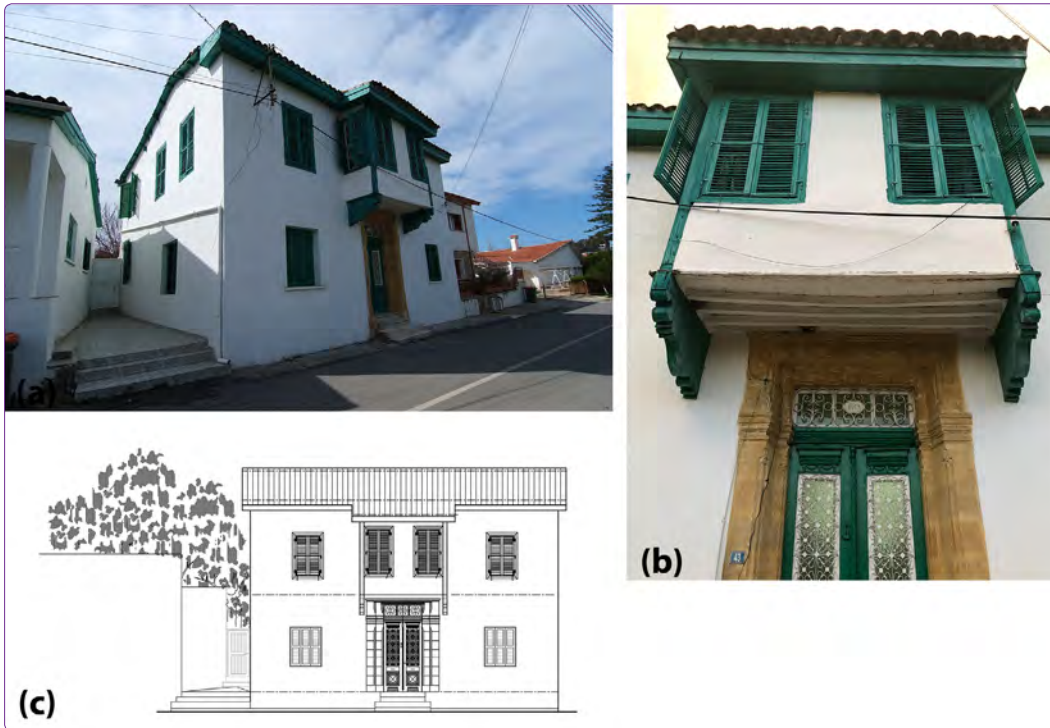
(a) South façade and east – entrance façade of the house. (b) Projecting bay. (c) East – entrance façade of the house. Source: Makbule Oktay, March 2019.
